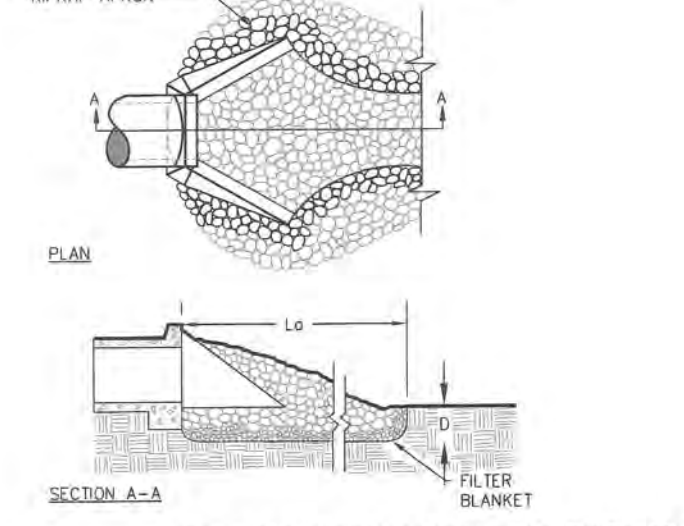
Riprap Outlet Protection (Modified From Va SWCC)
